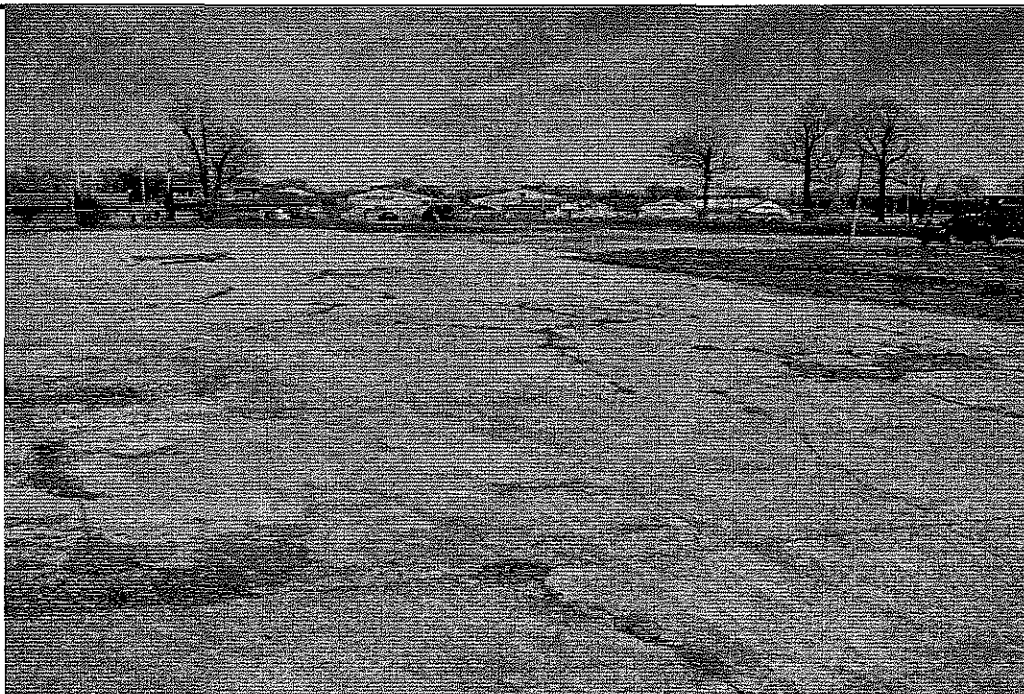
View looking northeast at backpad area. Some minor dried paint observed on concrete, main building.
